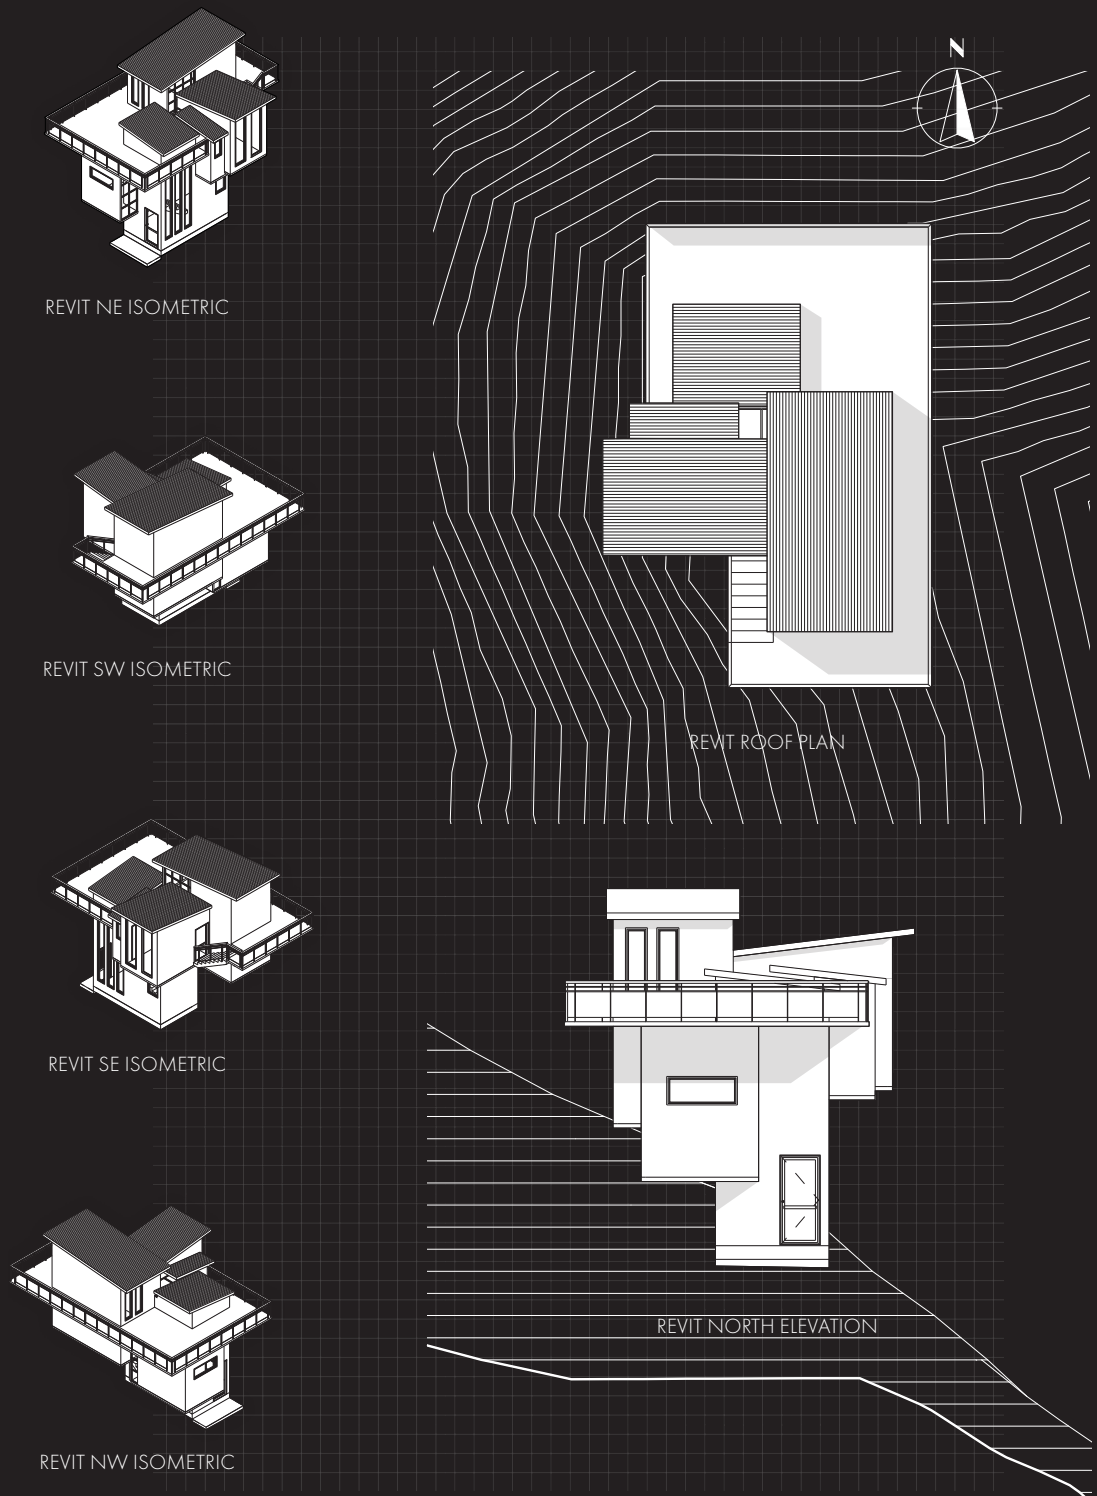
Architectural diagrams illustrating a single architectural mass worked up in Autodesk Revit using windows, walls, roofs, ballustrades, doors and floors.
